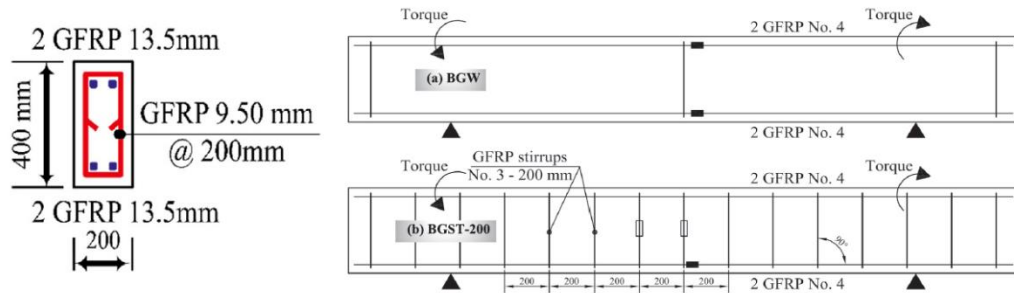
Details of section and reinforcement of tested beam in the experiment of Hadhood et al. [34]
